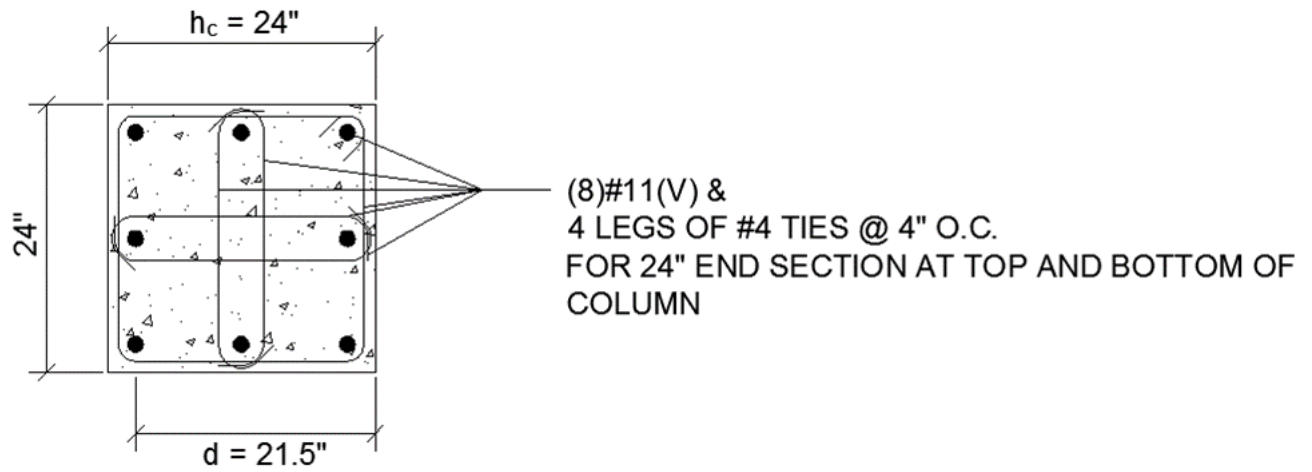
Exterior column, cross-section at end of column at ground floor level based on tsunami design requirements.
